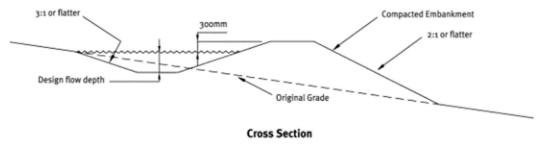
Alternative arrangement for diversion channels (AC GD05 Figure 19)
